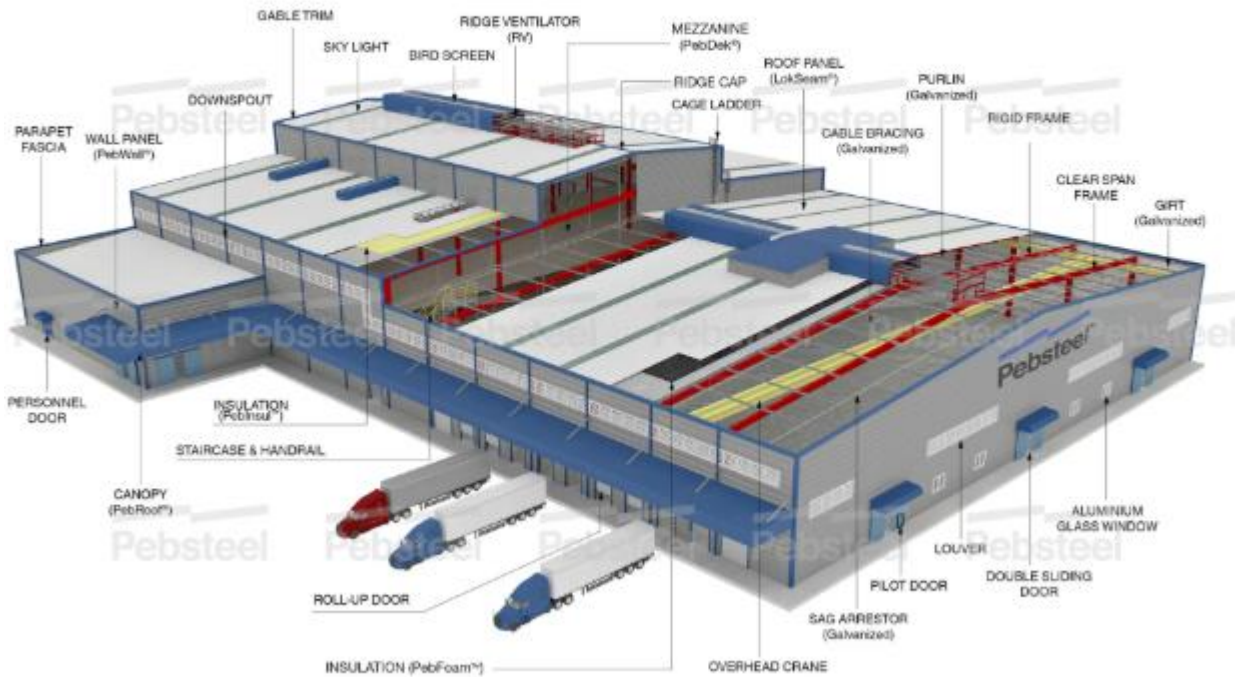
Pre-Engineered Building (PEB) Structural Layout [9]
